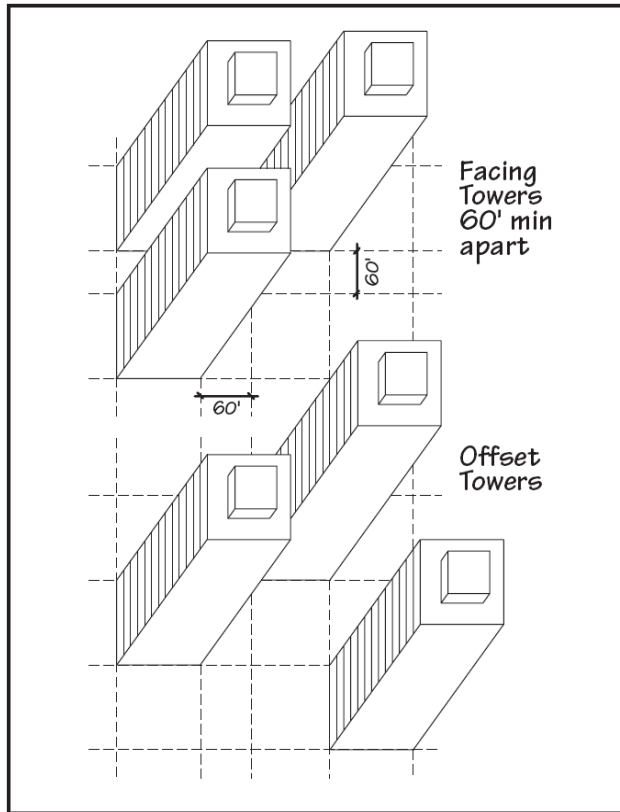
Offset Towers: Locate towers at least 60 feet apart for light, air and privacy. It is preferable to offset towers for added privacy and to provide distant views.
